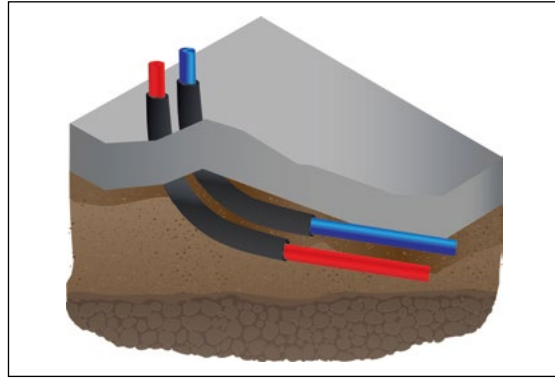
PEX Tubing Protected with Sleeving when Emerging from a Slab
